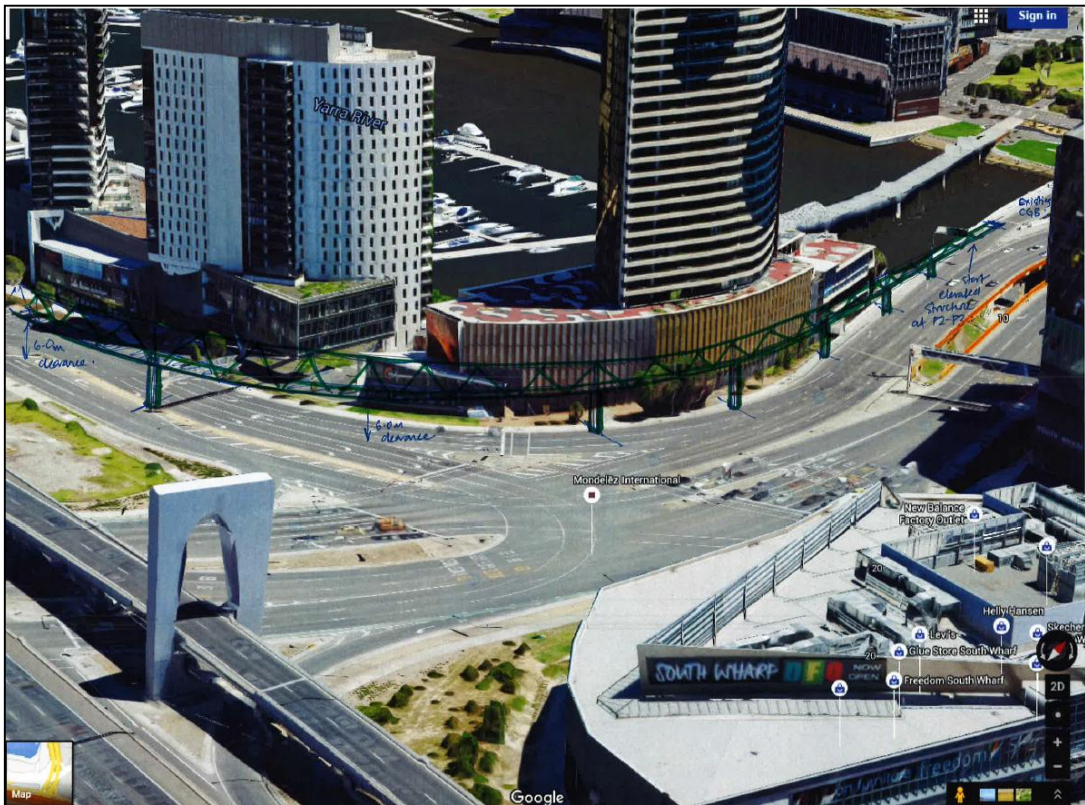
Sketch elevation of potential structure centre of Lorimer Street.
